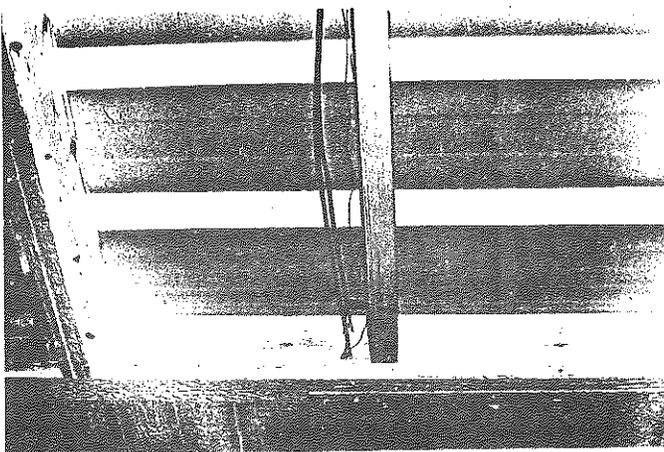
Photo of the lower part of a test wall before installation of the insulation.
